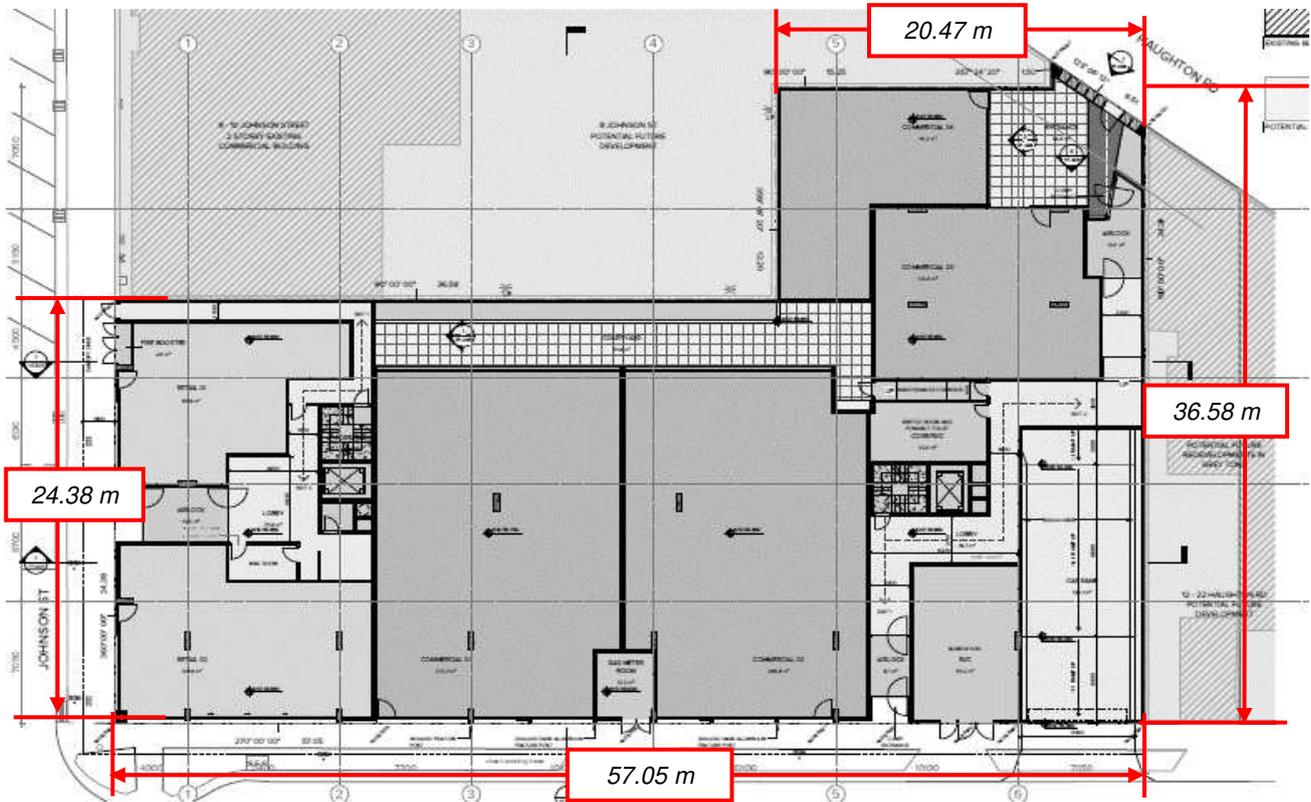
Ground floor plan with the plan-form dimensions overlaid.
